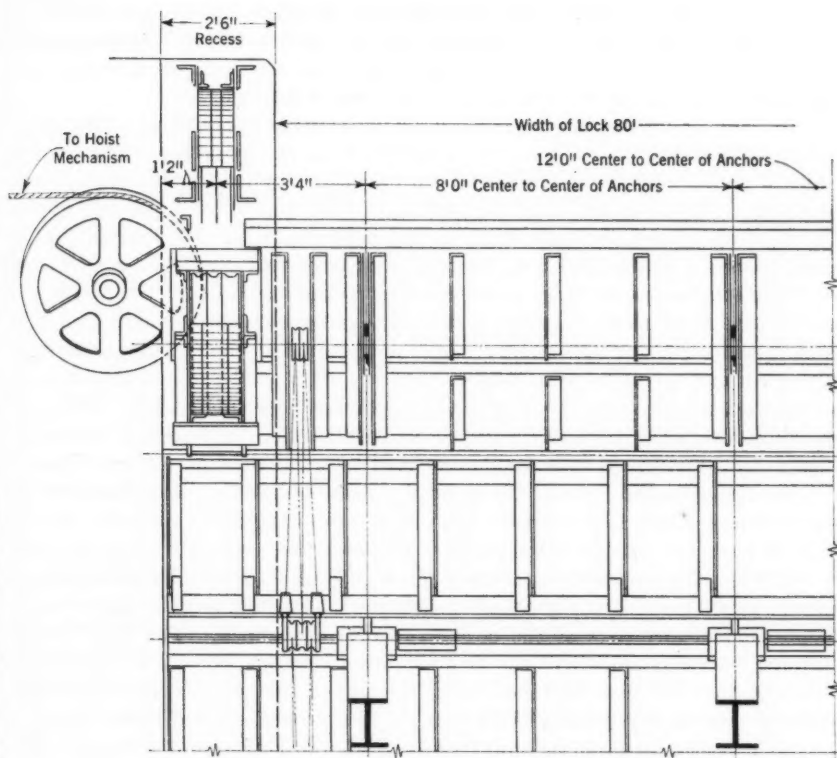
REAR ELEVATION, FACING DOWNSTREAM
